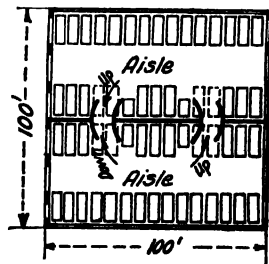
Floor plan garage 100 ft. square with patent ramp design and staggered floors. Capacity 52 cars.
